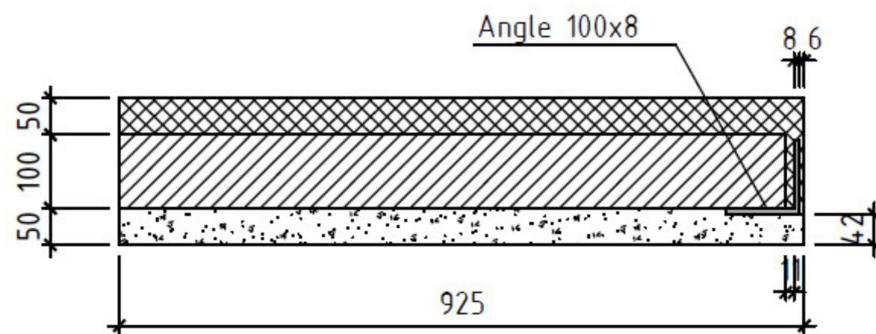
Calculation scheme without a gusset plate. The gaps between the angles and precast reinforced concrete elements are filled with thermal insulation (units: mm).
